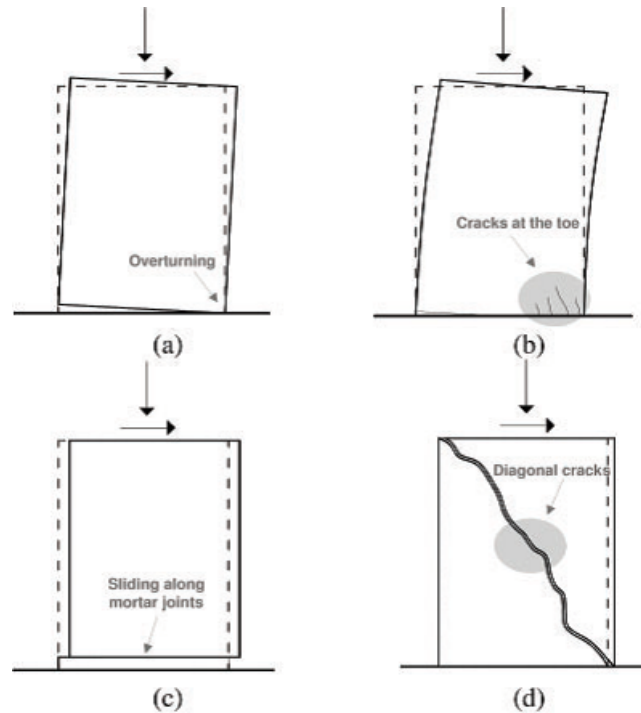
Typical failure mechanisms of masonry piers: (a) rocking; (b) toe crushing; (c) sliding; (d) diagonal cracking.[Oliveira et al., 2007]
